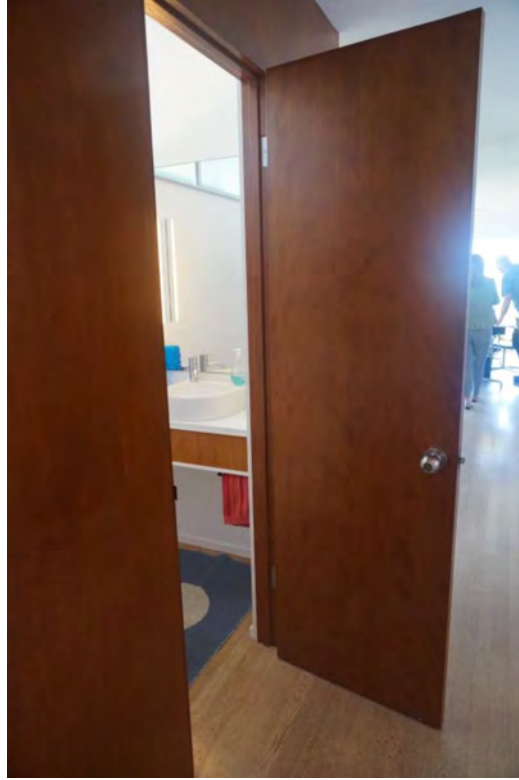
Door leading to the first-floor bathroom next to the main entrance. Camera facing south (Source: ESA 2021)
